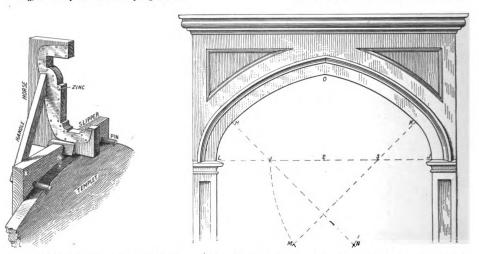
View of Mold Showing Position of Pins on Template and Slipper Horsed to the Mold.
